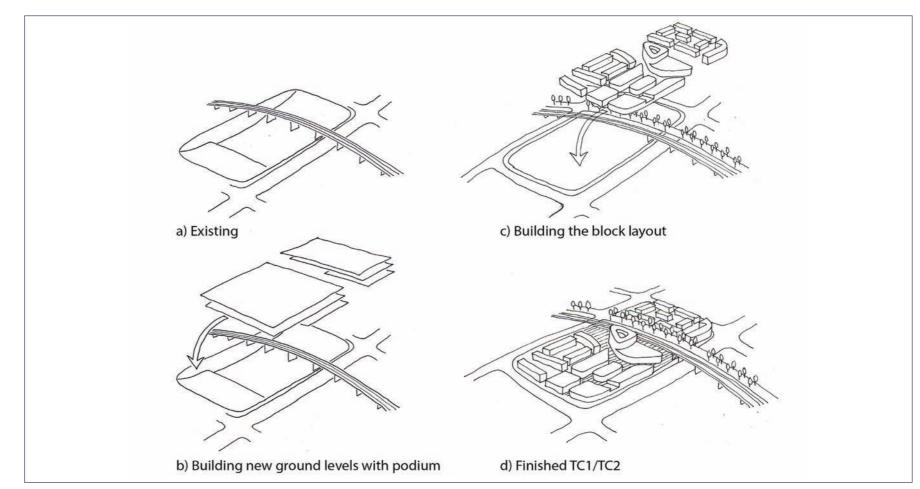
Building a New Ground Level - Concept Diagram showing TC1 and TC2
